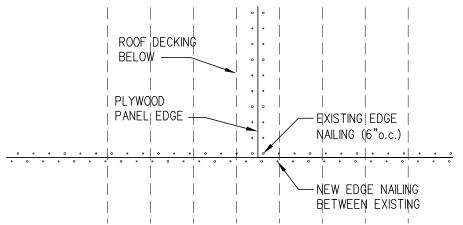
G: PLAN OF PLYWOOD PANEL EDGE NAILING
